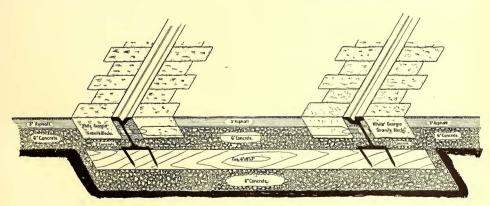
ISOMETRIC VIEW OF COMPLETED 1906 CONSTRUCTION
